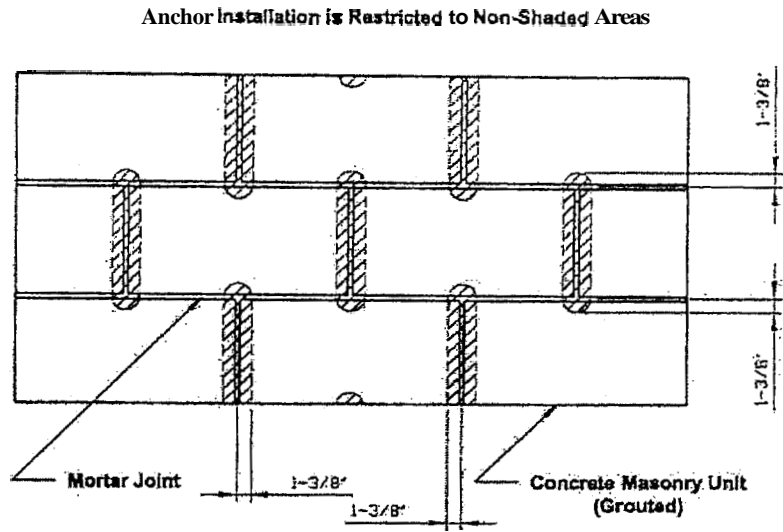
ACCEPTANCE LOCATIONS (NON-SHADED AREAS) FOR HILTI KWIK BOLT 3 ANCHORS IN GROUT-FILLED CONCRETE MASONRY UNIT
